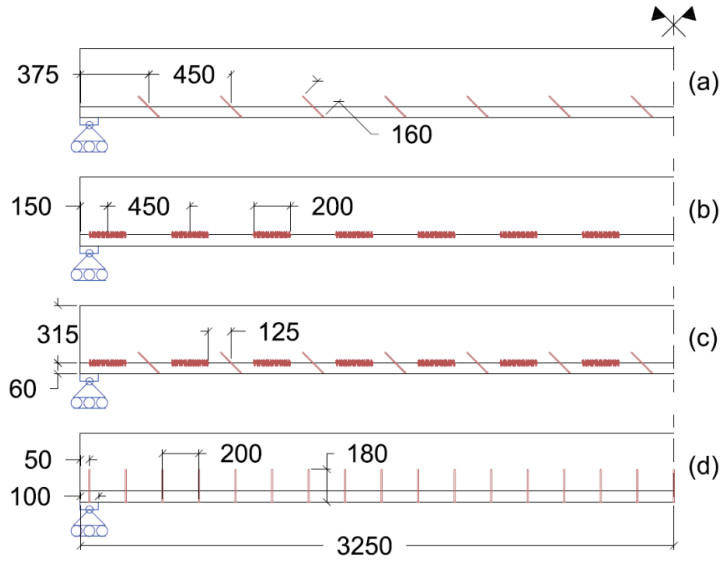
Configuration of the test series: (a) screws only (B1_S), (b) double-sided nail plates only (B2_NP), (c) double-sided nail plates and screws (B3_NP+S), (d) screw-gluing (B4_SG), (dimensions in mm).
